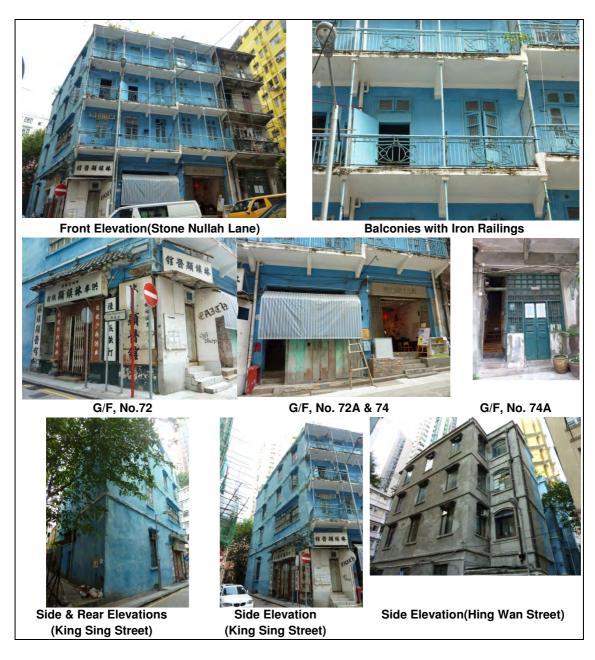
Site Photos of Blue House (72-74A Stone Nullah Lane) (Source: Courtesy of Mr. C.M. Lee)
